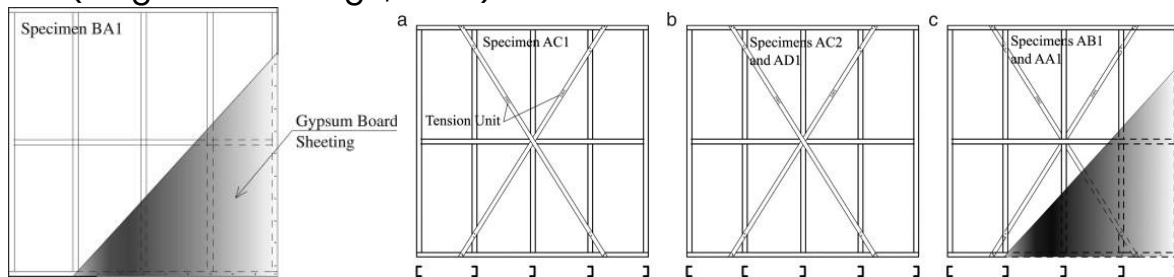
Some of CFS strap-braced stud walls test specimens (Moghimi & Ronagh, 2009)
